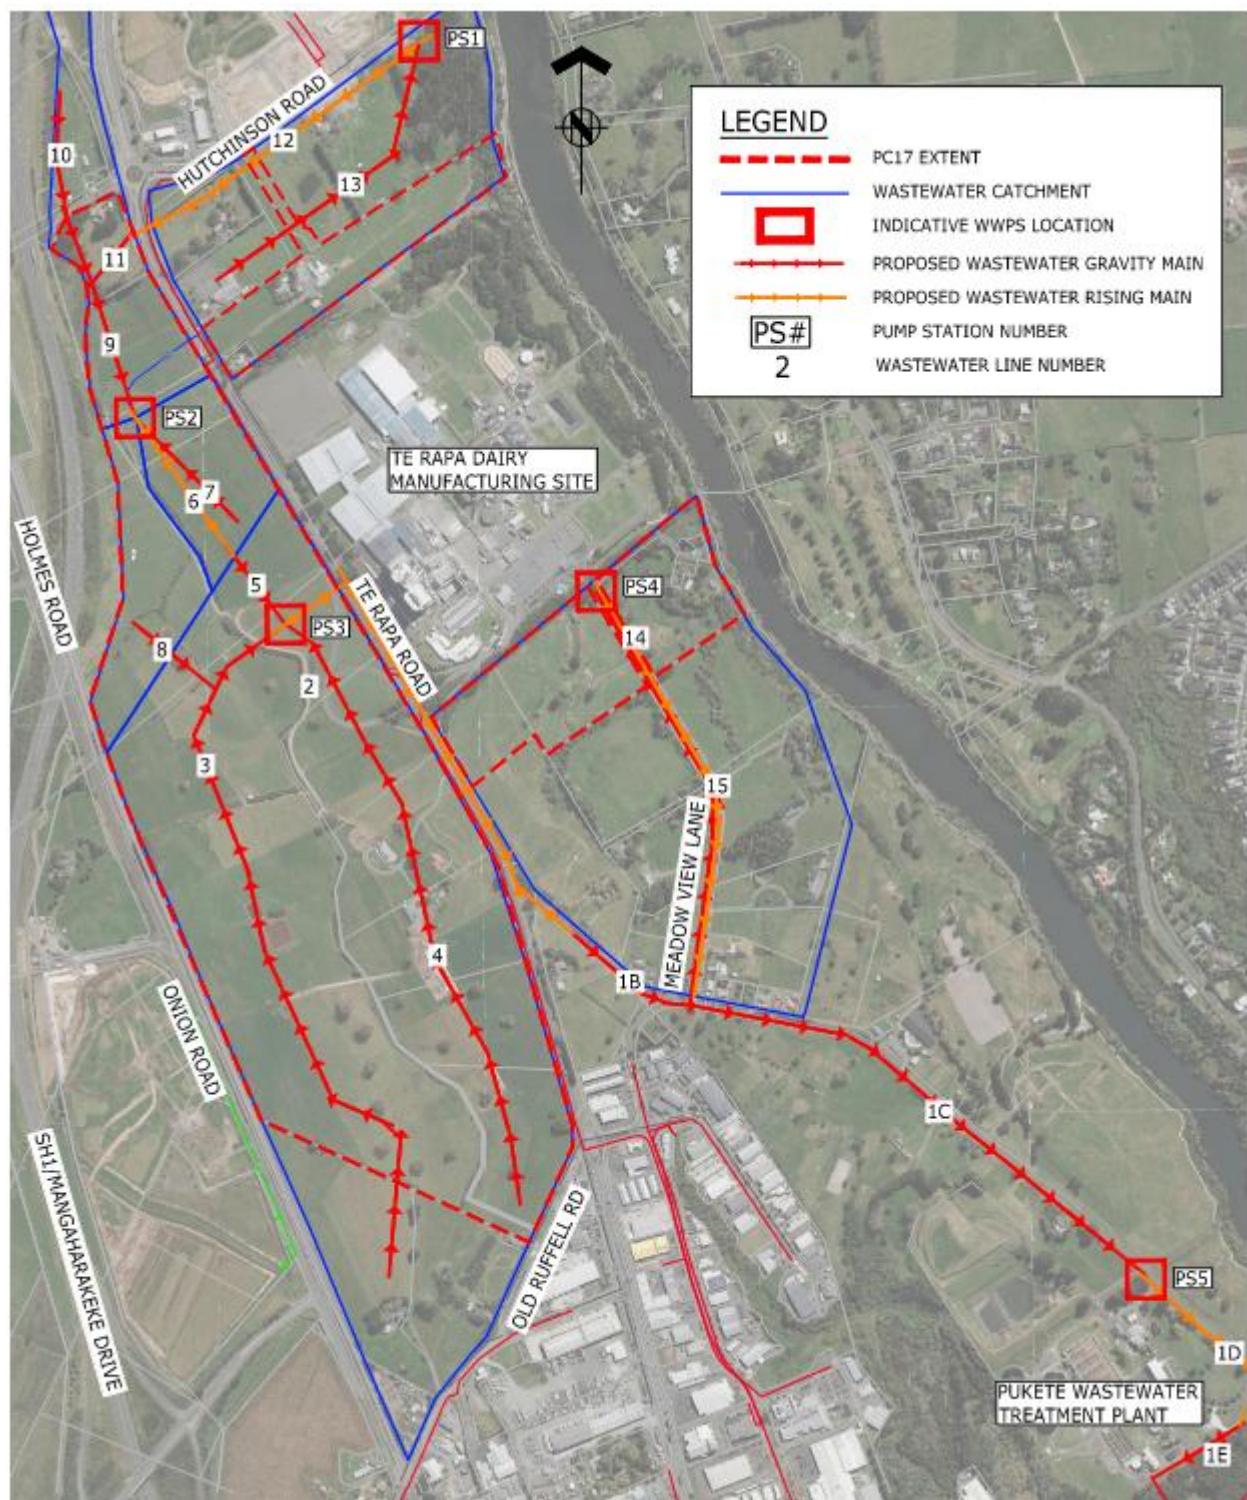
Te Rapa North Servicing Concept Layout Scheme Plan (Wastewater)
